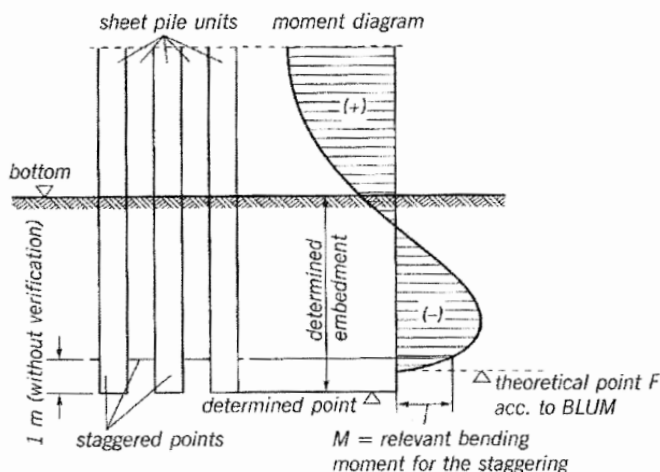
Staggered toe of sheet piling for a sheet pile wall fully fixed in the soil
